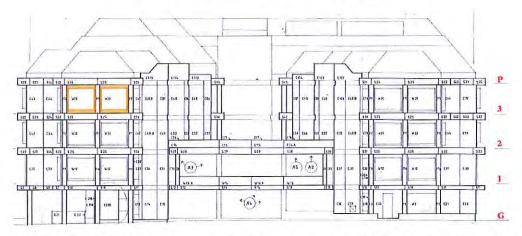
East Elevation of Block A indicating precast panels likely to be damaged at around 40 % DBE loading, assuming panel connection bolts placed centrally within oversized holes.
